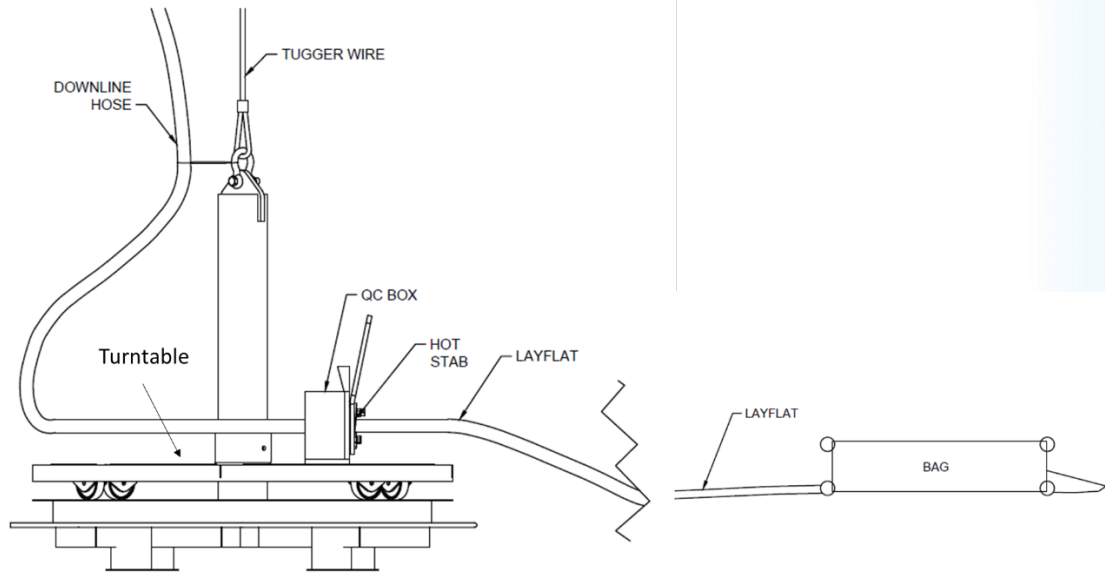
Illustration of subsea equipment used to inflate the formwork
